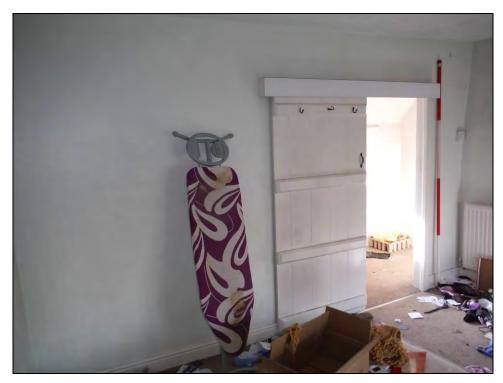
South-west wall of Room F4 (scale = $1 \times 2m$).
